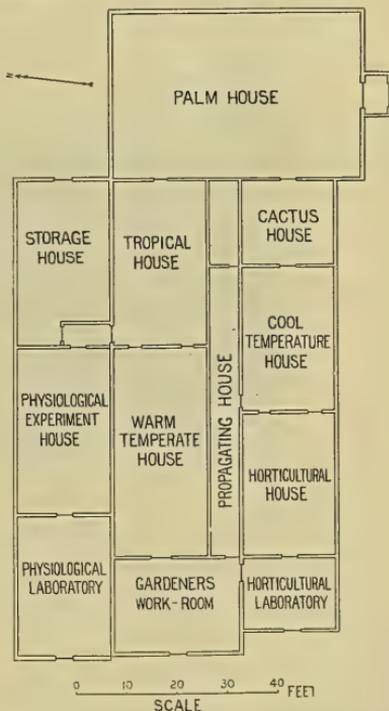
Ground-Plan of the Lyman Plant House at Smith College.
